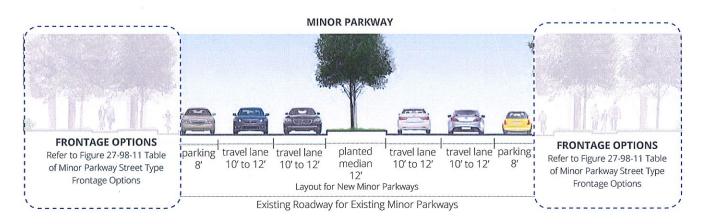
MInor Parkway Street Section - Existing and New
